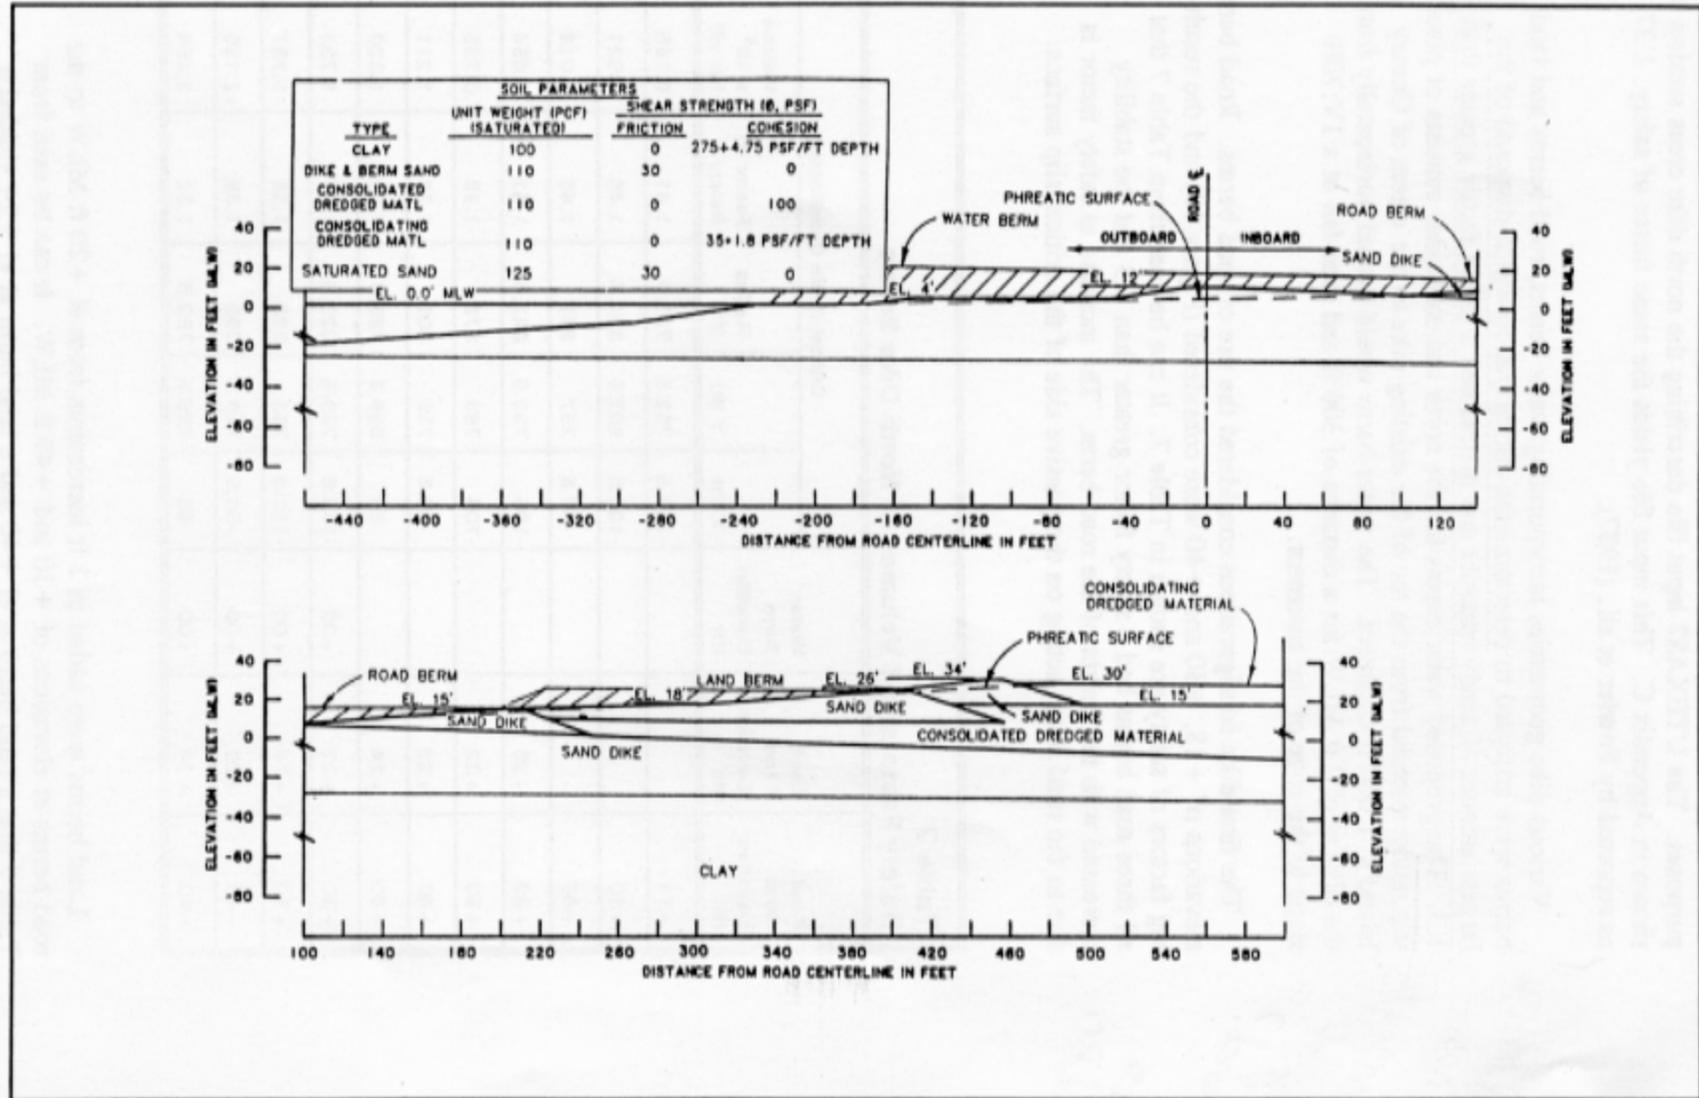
Northwest perimeter dike cross-section showing relation between road, land and water berms
